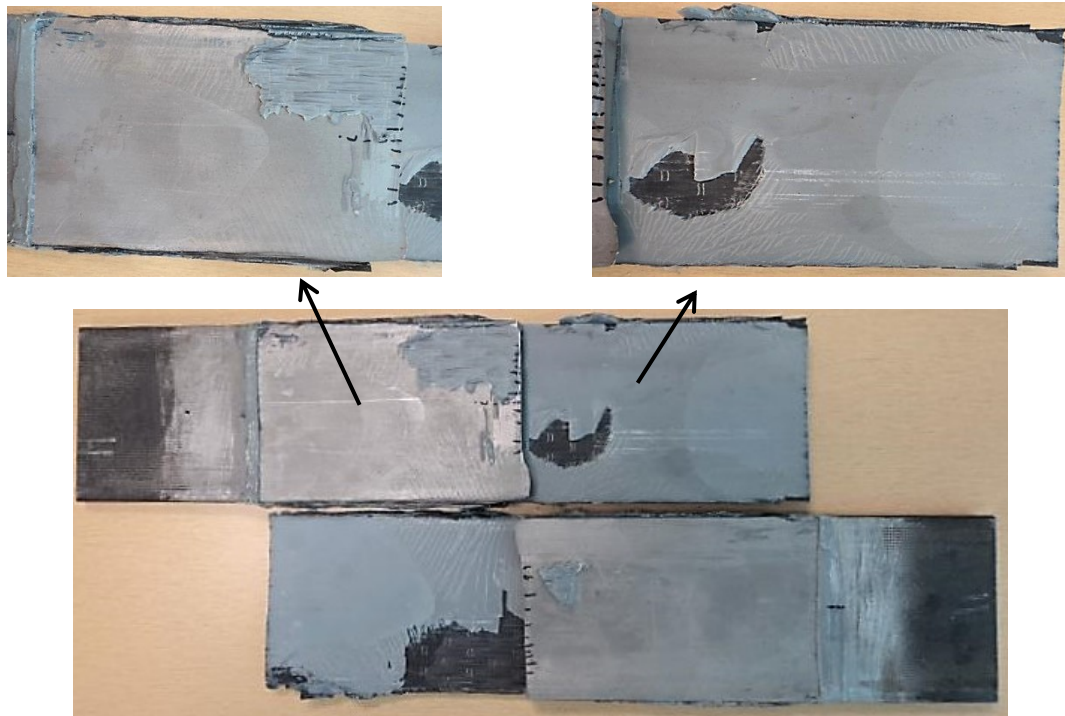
Delaminated CFRP surface and the failed specimen 3-Sikwrap-Sk-330
